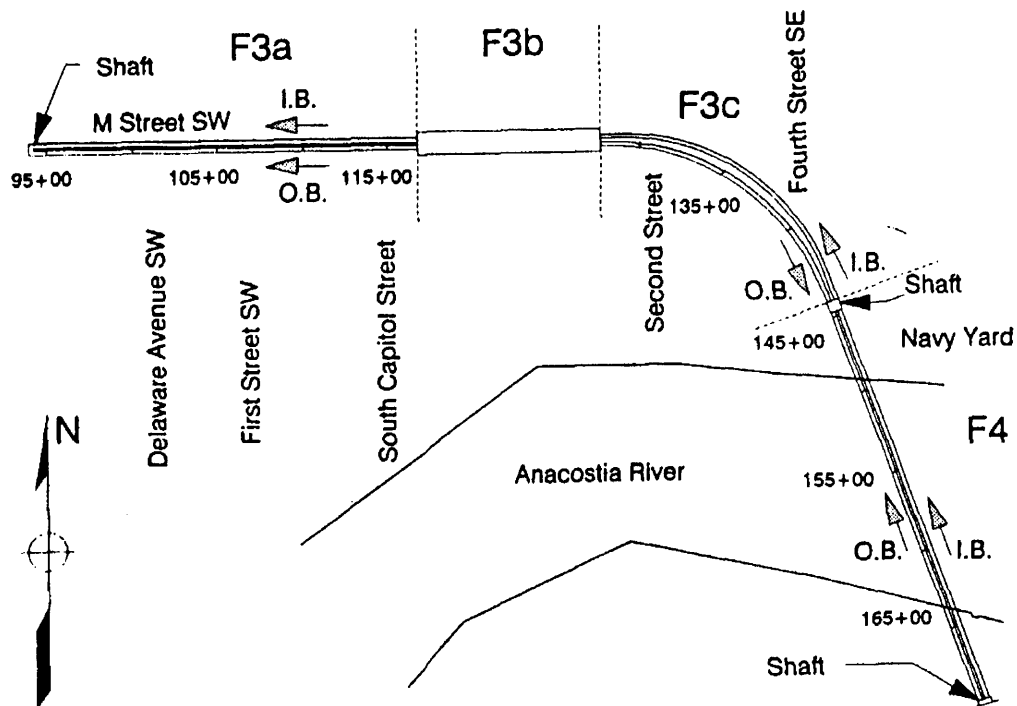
Plan view of tunneling project (after Clough and Leca, 1993)
